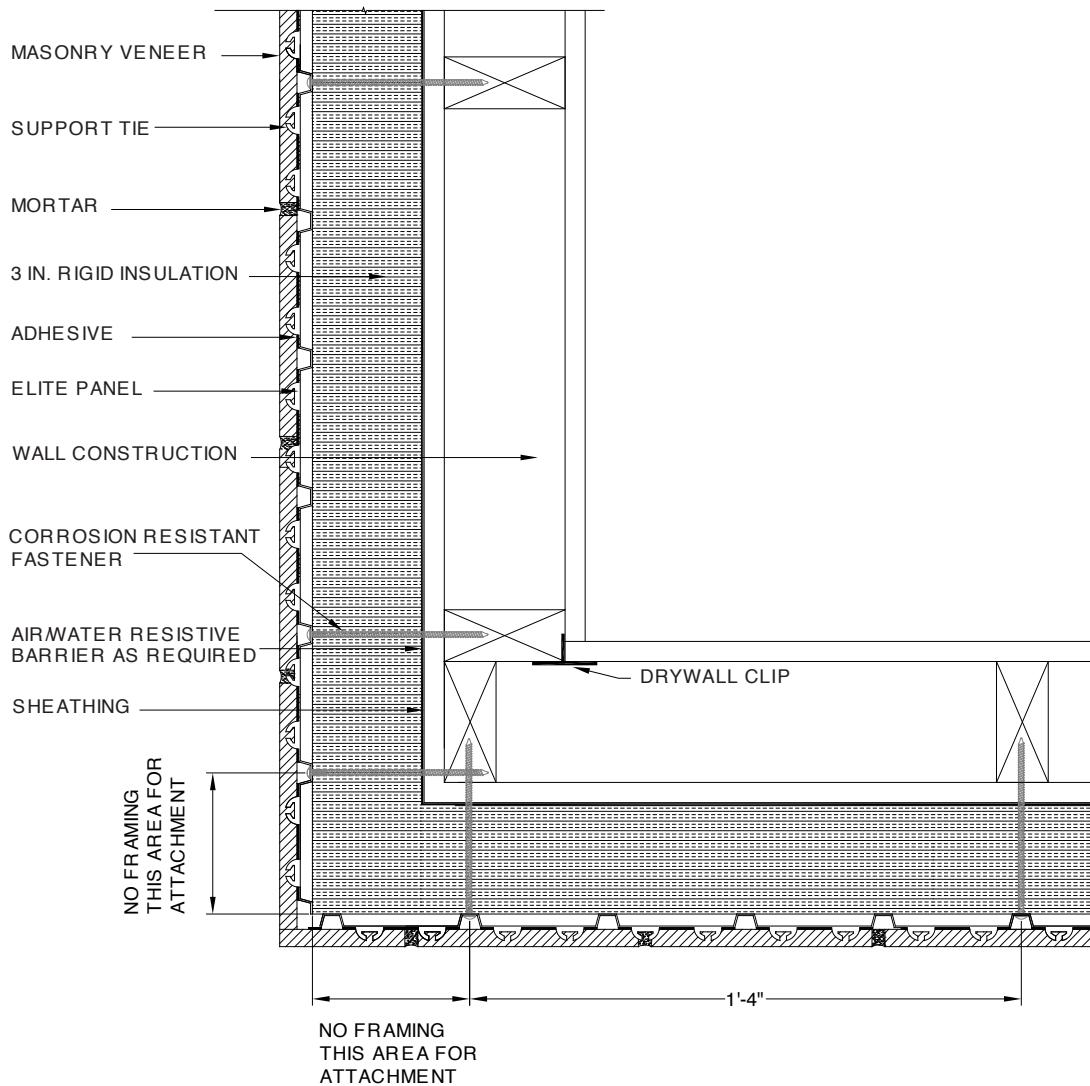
PLAN VIEW AT 2-STUD CORNER
